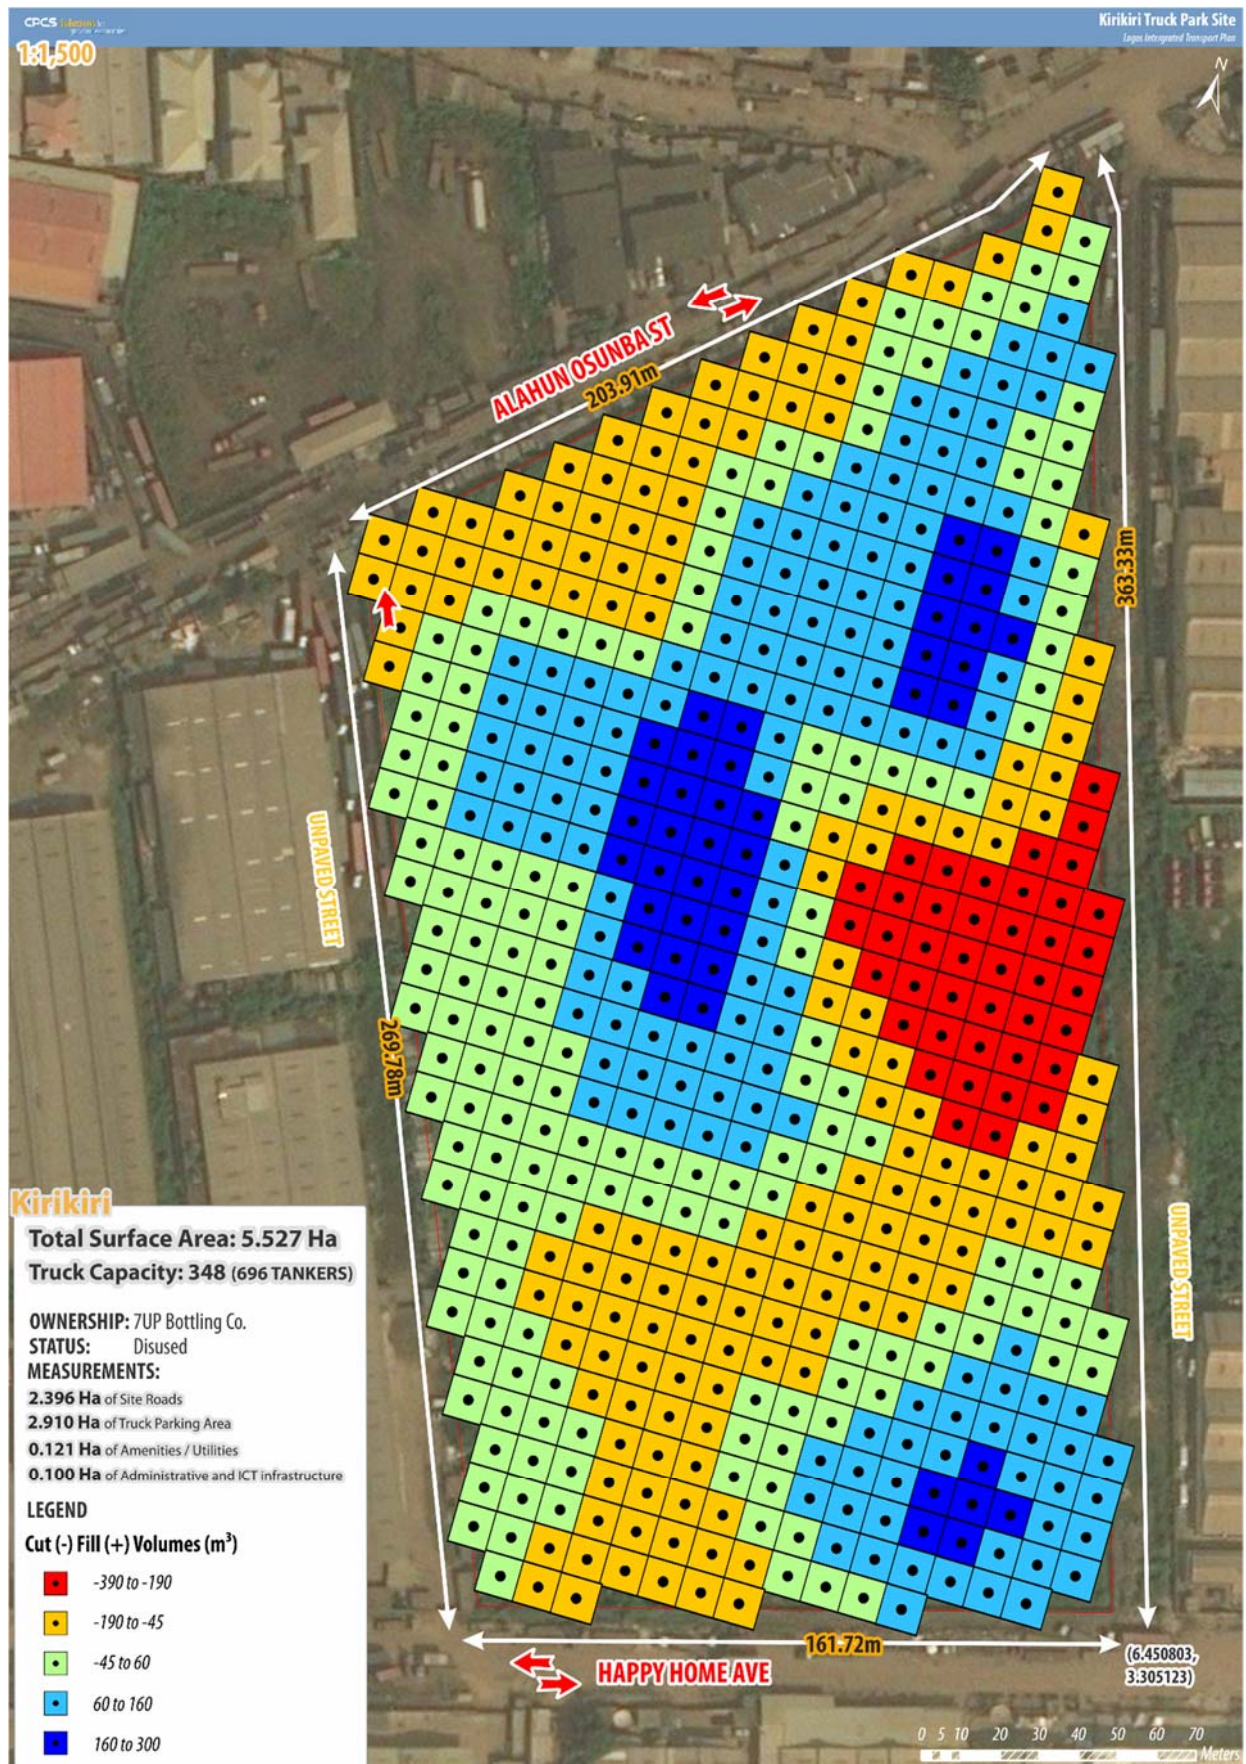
Kirikiri Truck Park Site (2) Terminal Layout – Site Preparation
